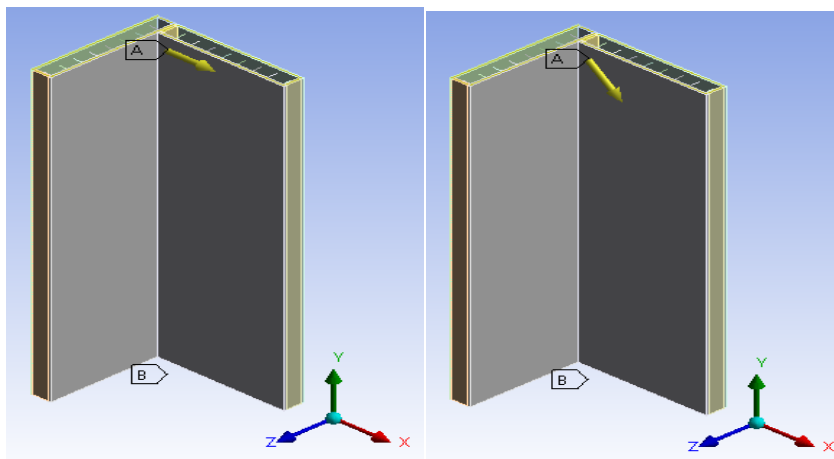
Geometry of T- shaped stainless- steel core plate wall.
